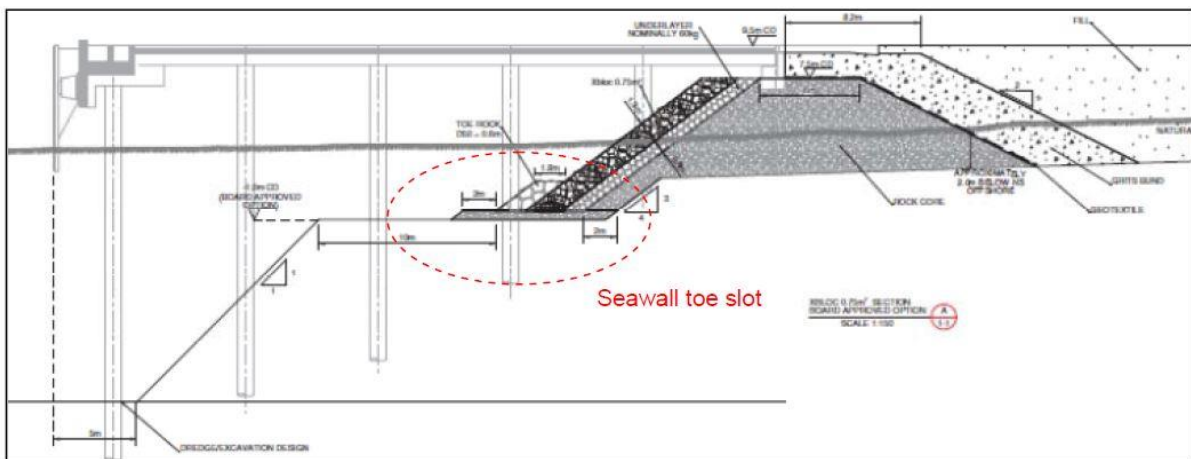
Typical section of rock & 'grits' perimeter bund - slope protection under wharf
